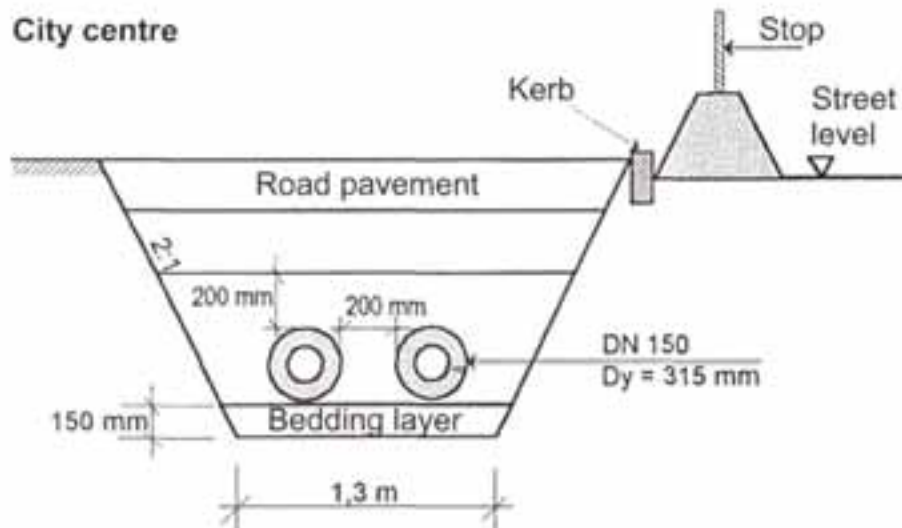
Example of pipe trench section in city centre. Pipe dimension DN 150
